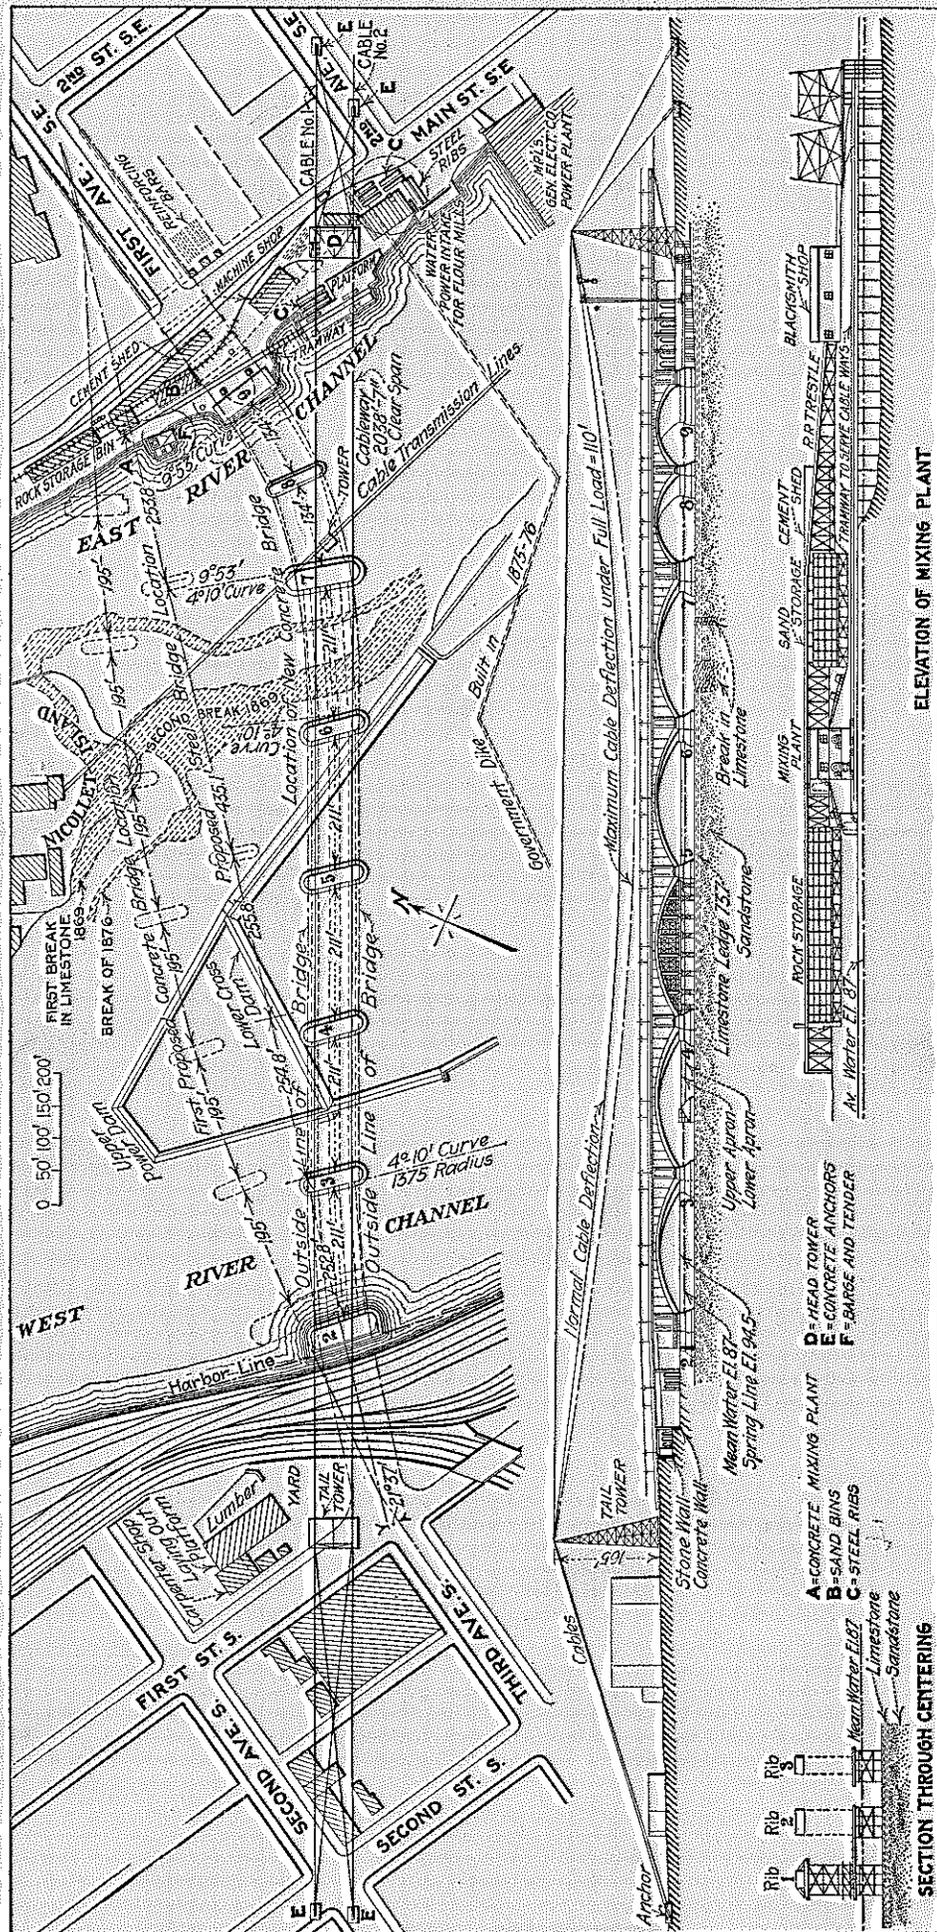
PLAN AND ELEVATION OF THE THIRD AVE. REINFORCED-CONCRETE ARCH BRIDGE OVER THE MISSISSIPPI RIVER AT MINNEAPOLIS, MINN.
